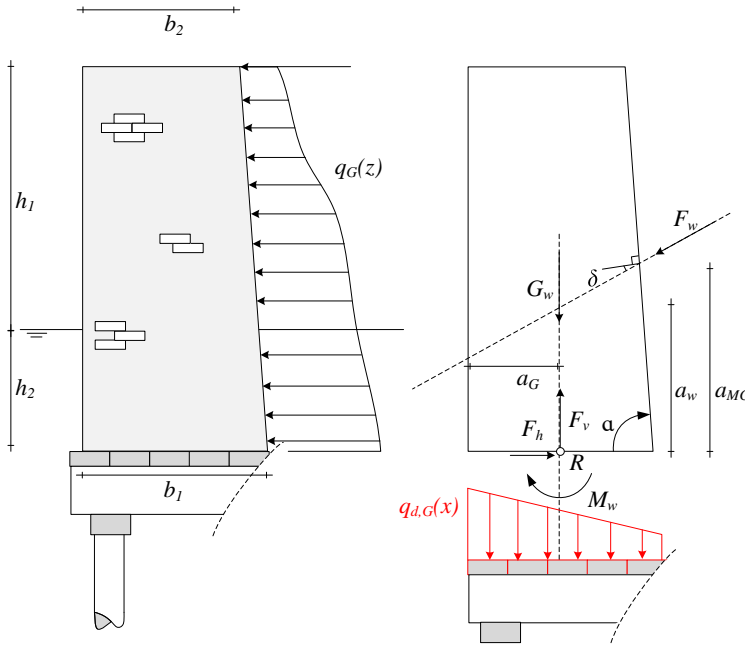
The gravity wall transferring its load own weight G_w and horizontal load F_w towards the timber quay wall floor as a distributed load $q_{d,G}(x)$.
